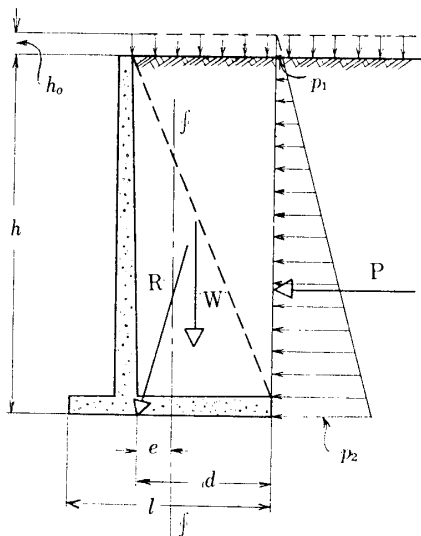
Relation between reinf. conc. retaining wall and external forces
